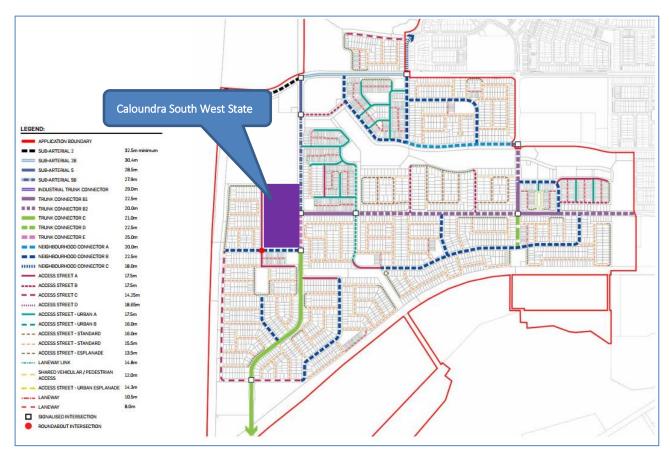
Future Road Hierarchy & Type of Intersection Control (Source: Stockland)
